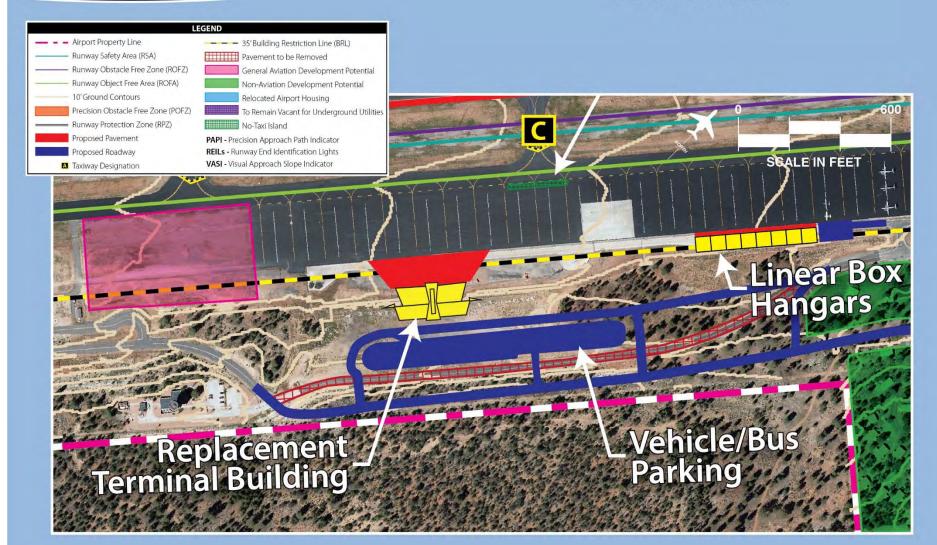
A RECOMMENDED MASTER PLAN CONCEPT
